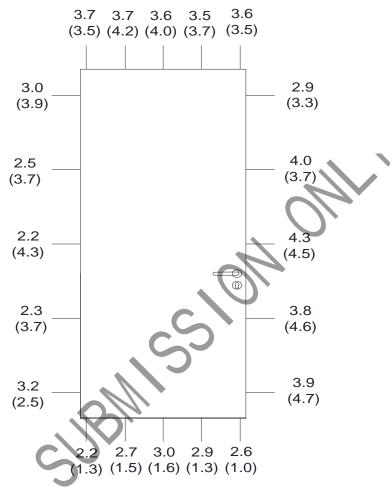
Gaps Measured between Door Leaf and Door Frame as Viewed from the Unexposed Face of Specimen FU236218 All dimensions are in mm.
